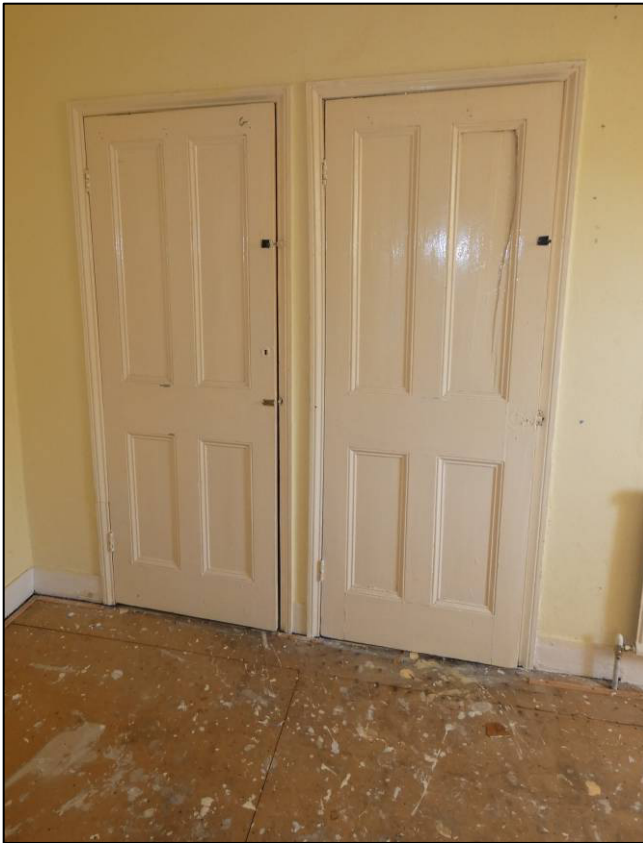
Room 3F4, wall cupboards to east wall, looking SE (photo 1/887).
